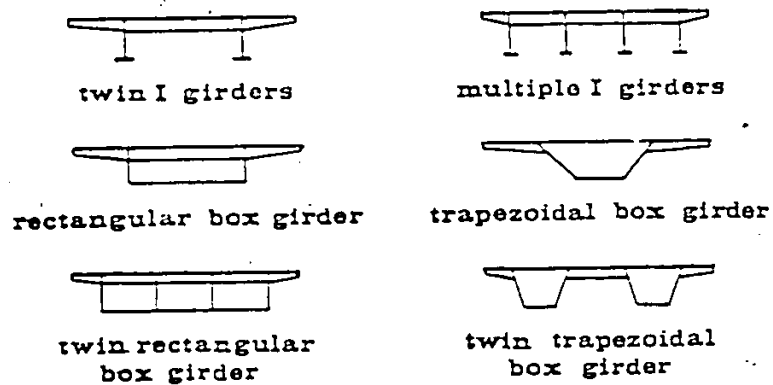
Bridge Deck Cross sections (After [15])
